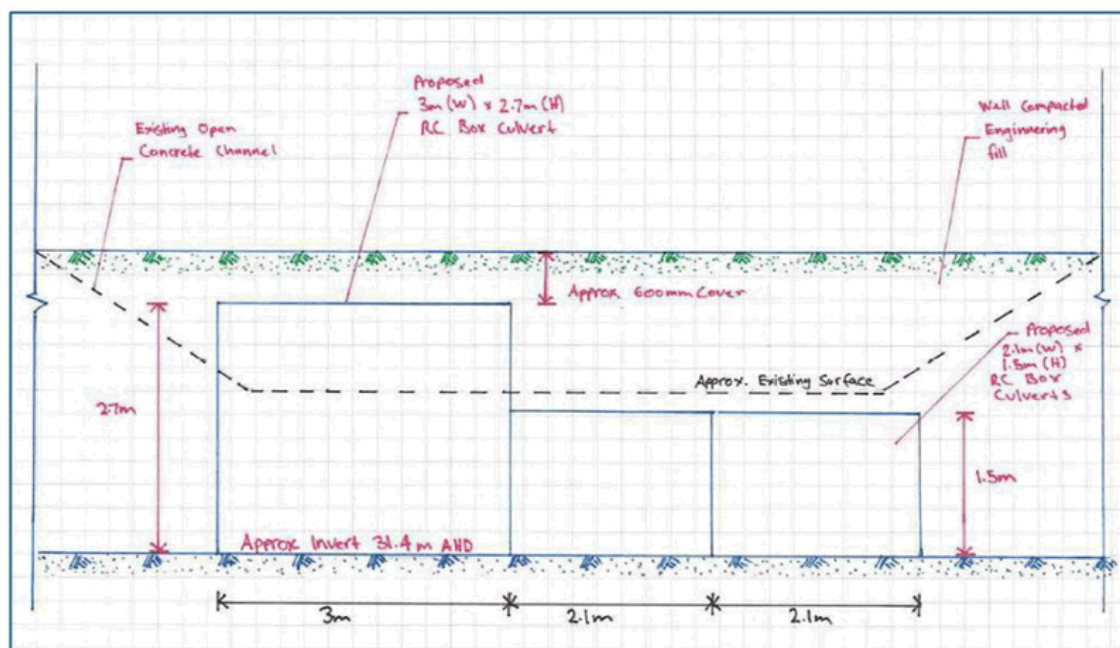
Cross Section of Proposed Culverts Replacing Concrete Channel (Looking Downstream)
